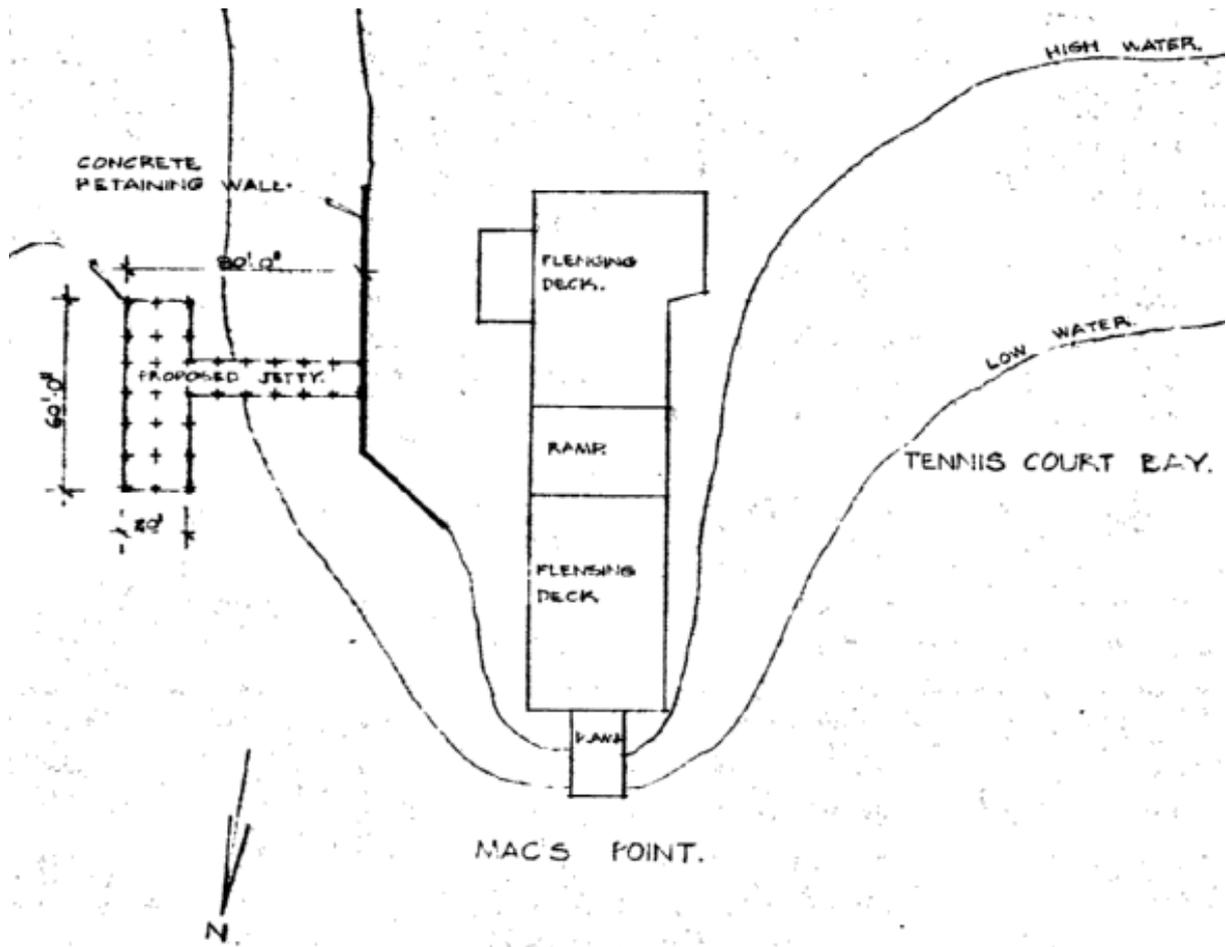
Plan of the whaling station in 1959, showing proposed jetty. MD plan 10721.
